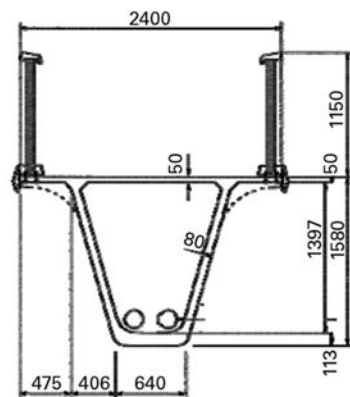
View of bridge and section [Ductal[®]], [147]
